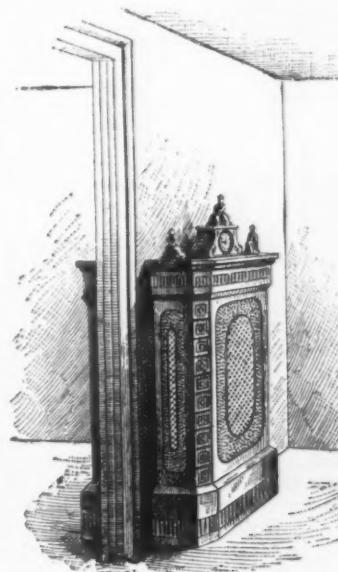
Stove in Front and Back Parlor of House of American Consul Potter at Crefeld.
